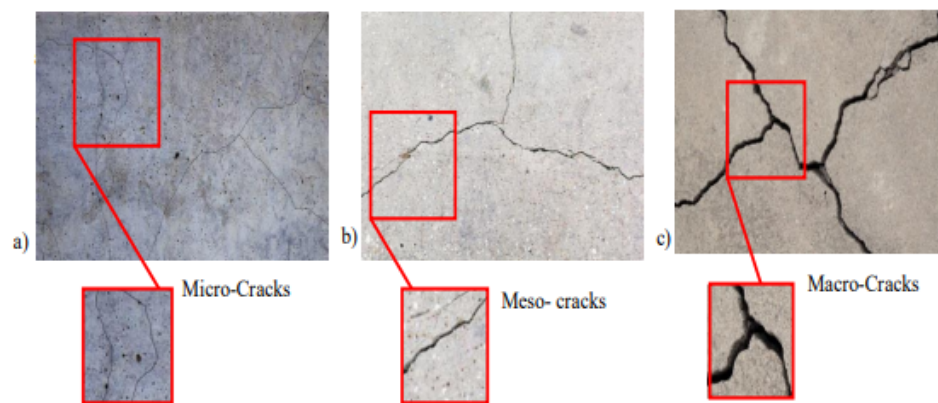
Cracks in Rigid pavement; a) tiny cracks, b) intermediate cracks, c) large cracks. [13, 14]
